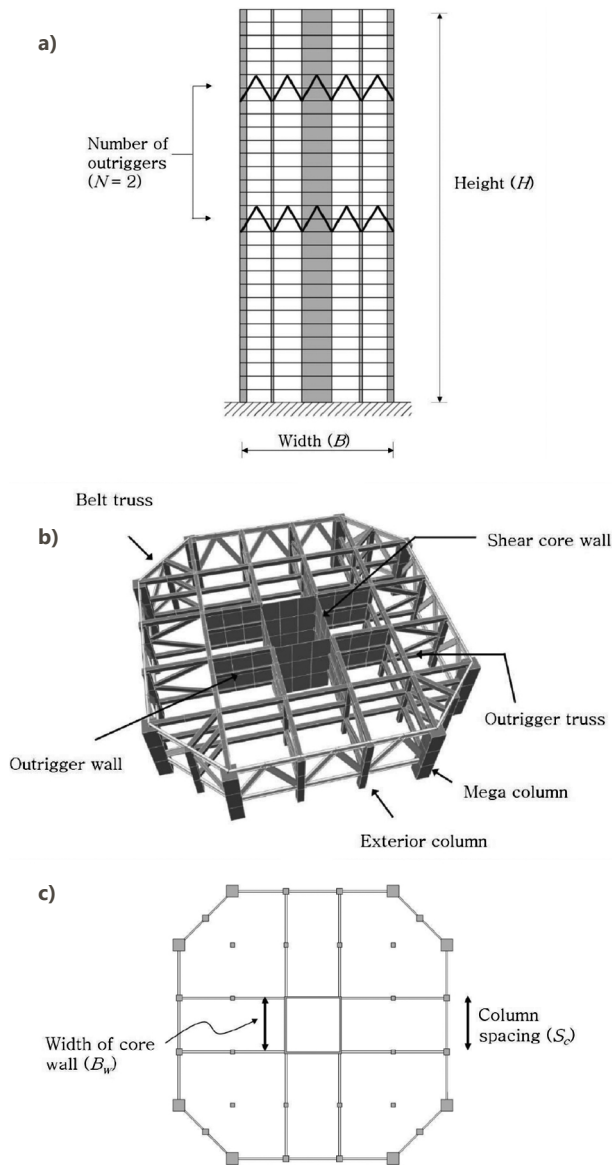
Mega-structure system and design parameters used in this study: illustration for a – sectional view of a mega structure; b – shear core wall, outrigger, mega columns, and c – floor plan of mega structure
